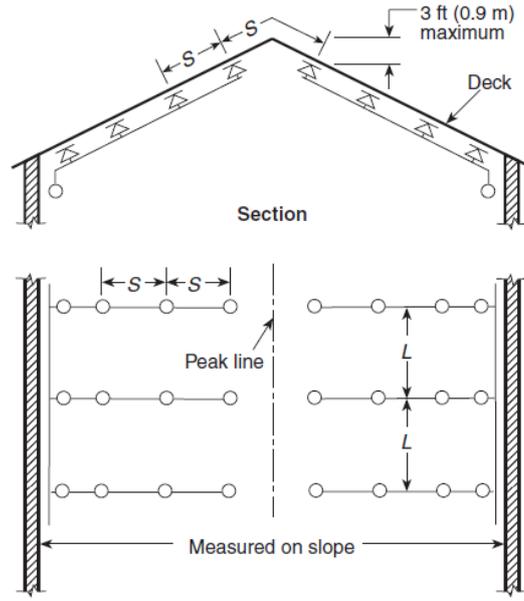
(b) Maximum Distance Between Sprinklers with Sloped Ceilings — Arrangement B.
